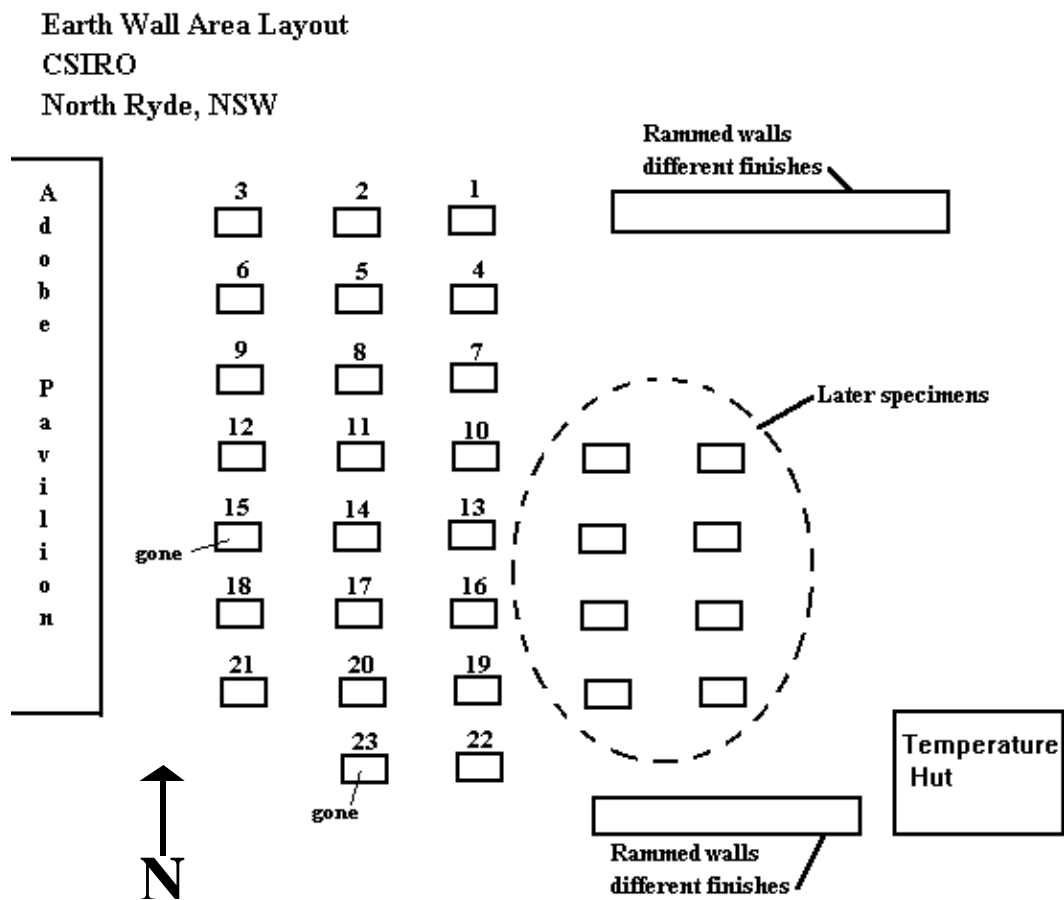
Lay out of Middleton's (1947) test rammed earth walls at North Ryde, New South Wales.
